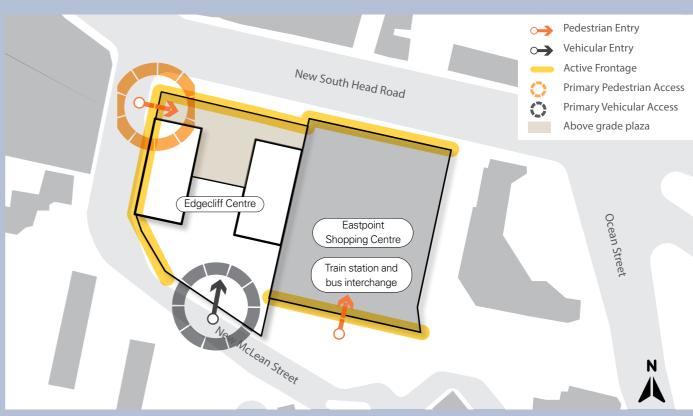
Concept plan of envisioned development at 203-233 New South Head Road(SJB 2018)
